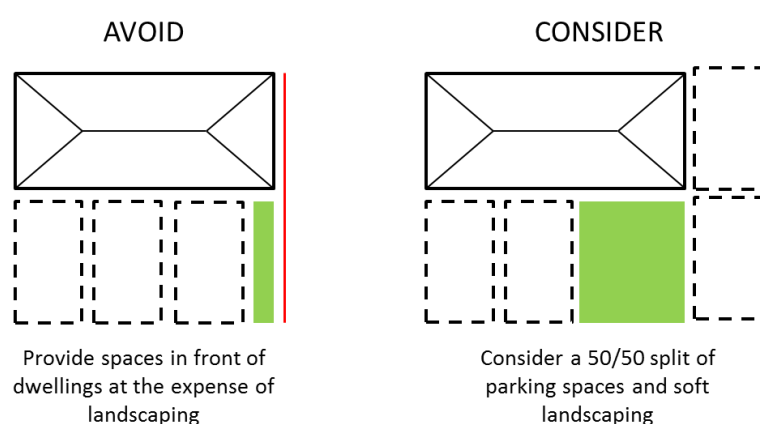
above: A 50/50 approach to providing parking spaces and landscaping in front of new dwellings
